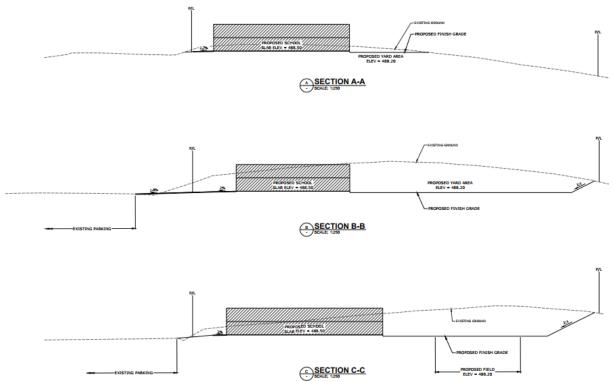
Cross Section and Elevation Drawings for the proposed Elementary School. For further details, please see ATTACHMENT C.
